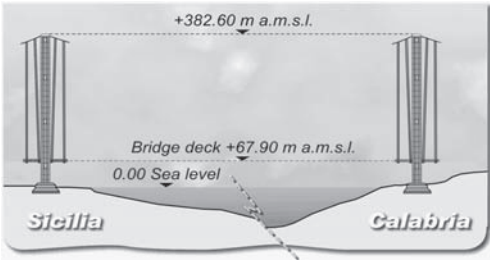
Towers of the one-span suspension bridge over Messina Straits.
